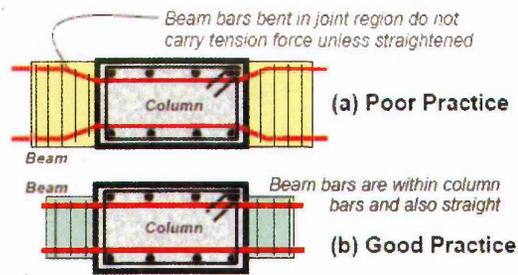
Anchorage of beam bars in interior joints; diagrams (a) and (b) show cross sectional views in plan of joint region (IITK-BMTPC, 2003)
